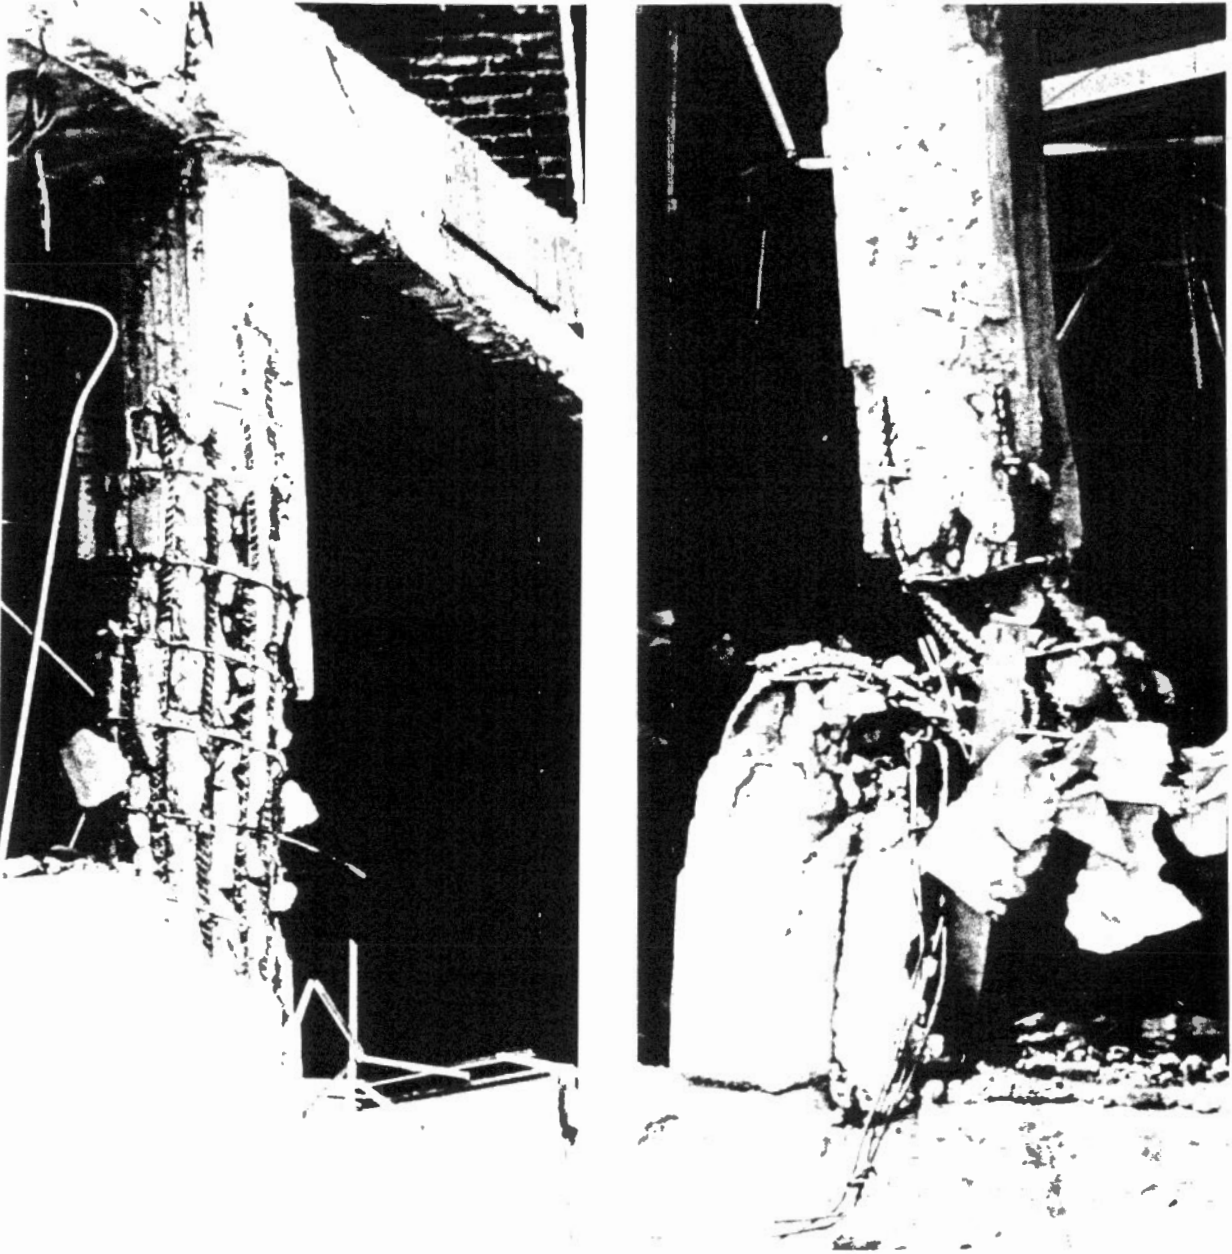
and 6.19d Column Failures in Theatre (Televiteatro)
